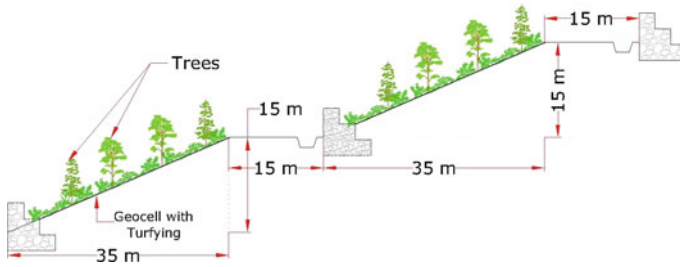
Embankment slope protected with gabion, drainage, soil cover with geocell with turfing and plantation
